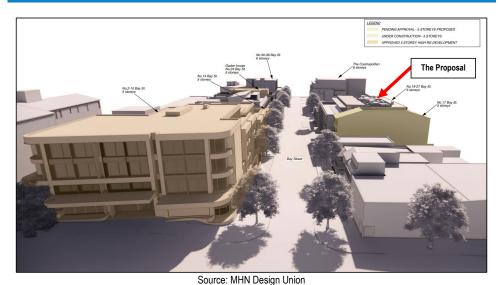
Existing, Proposed and Approved Developments within the Neighbourhood Area and Visual Catchment of the Subject Site (Bay Street)
